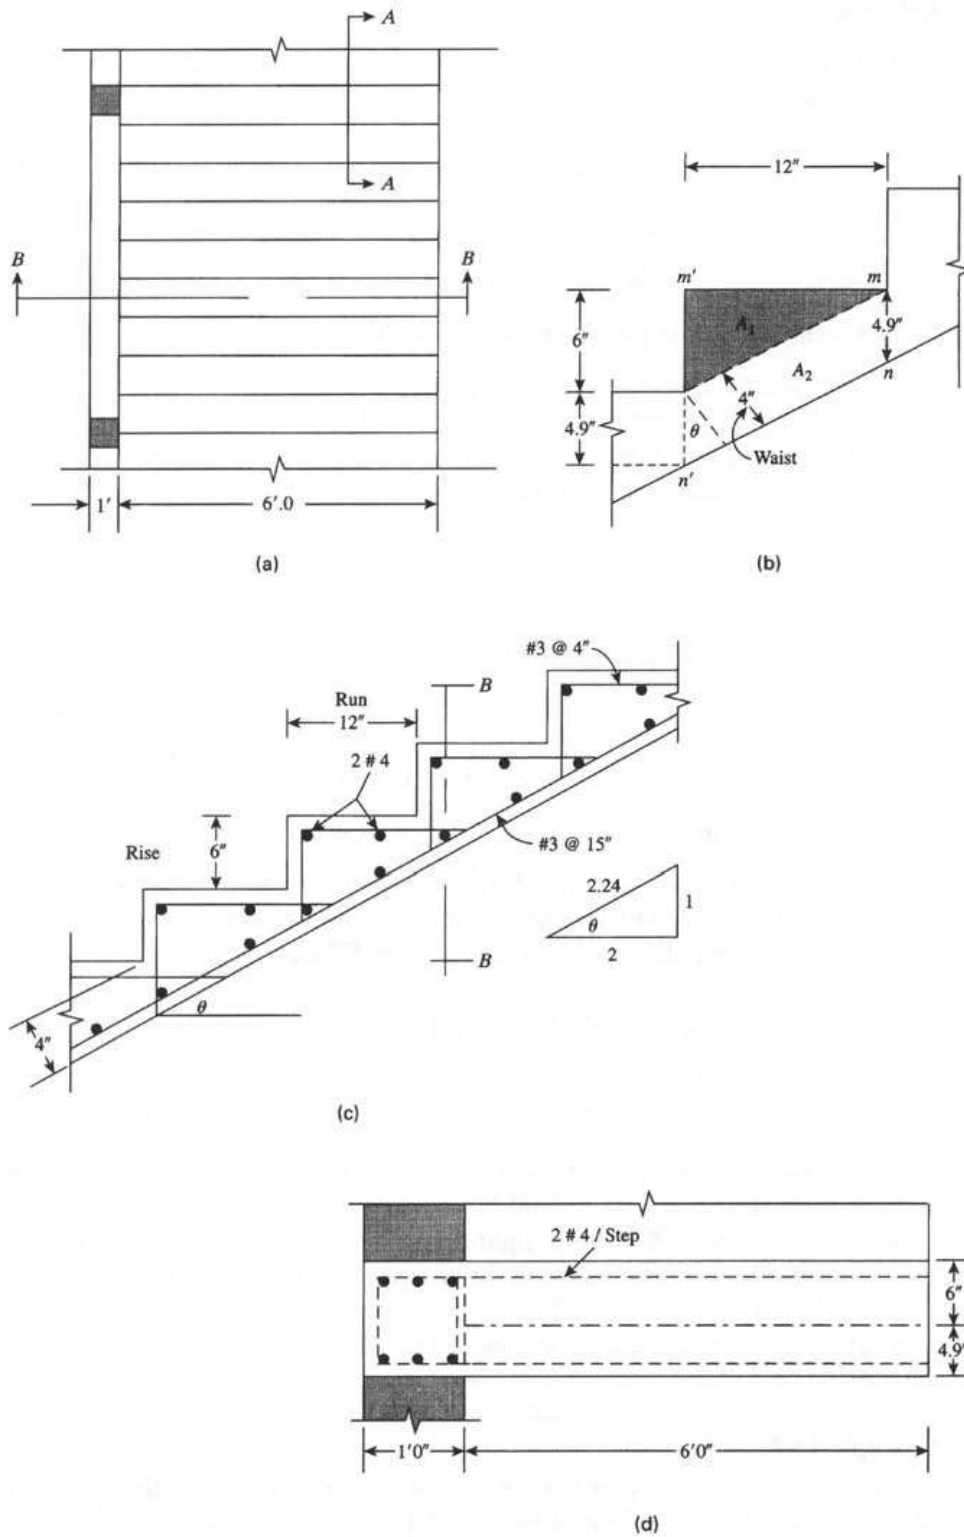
Example 18.1: cantilever stairs: (a) plan, (b) section in one step, (c) section A-A, and (d) section B-B.
